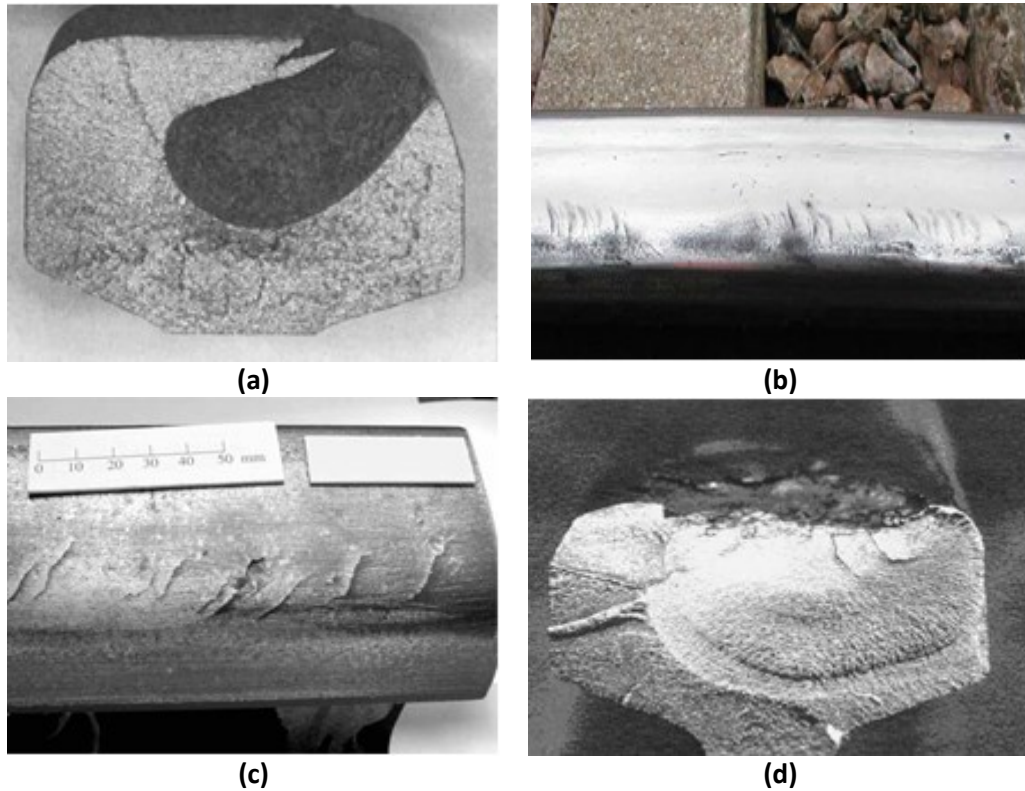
Examples of RCF cracks: (a), (b) & (c) head checking (gauge corner cracking) and (d) squats [2, 11].
